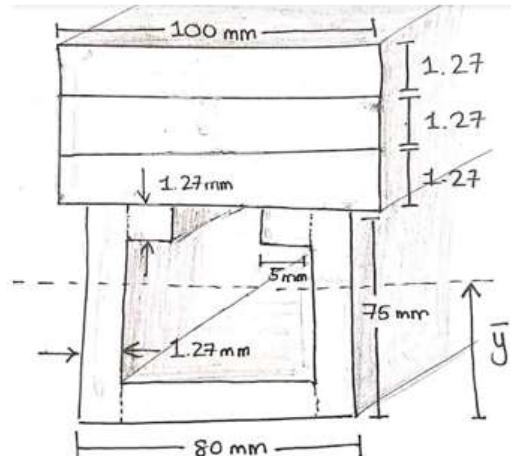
Design 1 Cross-sectional view with dimensions (Not drawn to scale)
